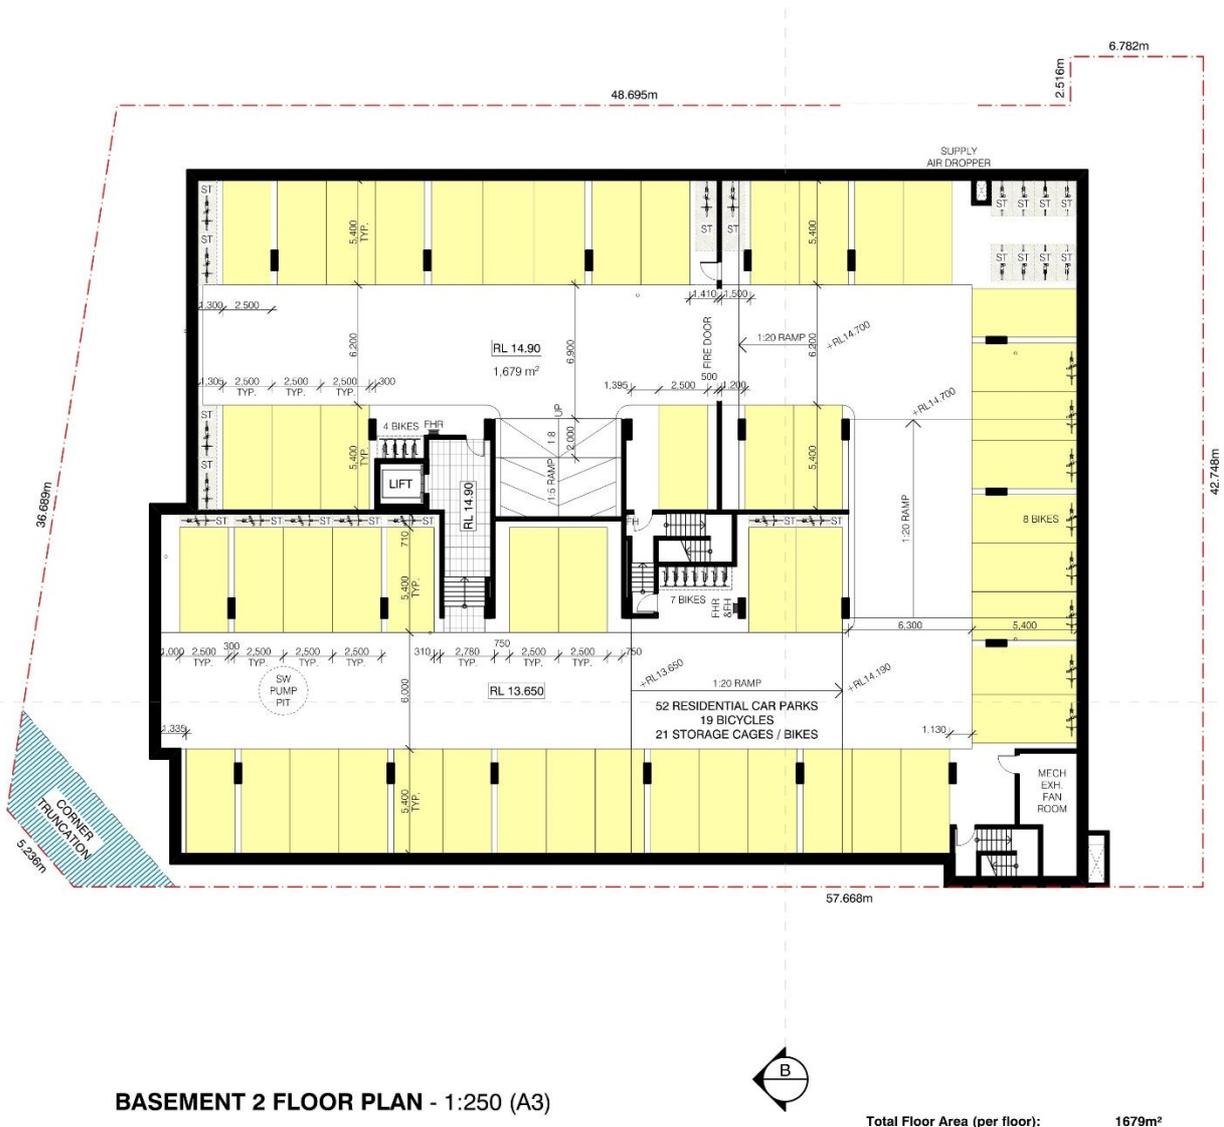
The proposed Basement 2 Floor Plan with the boundaries of the amalgamated landholding that comprises the subject site shown with dotted linework. Note the generous boundary setback distance proposed towards the common boundary with the adjoining heritage place – at image right. (Source: bda Architects)
